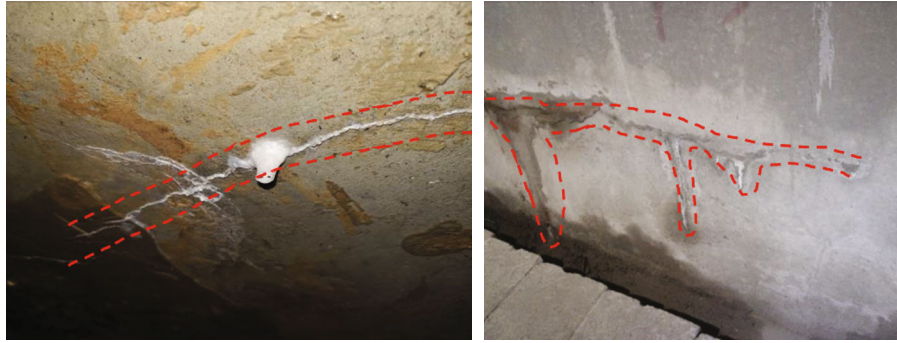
The DLJ tunnel lining cracking and water seepage flooding.
